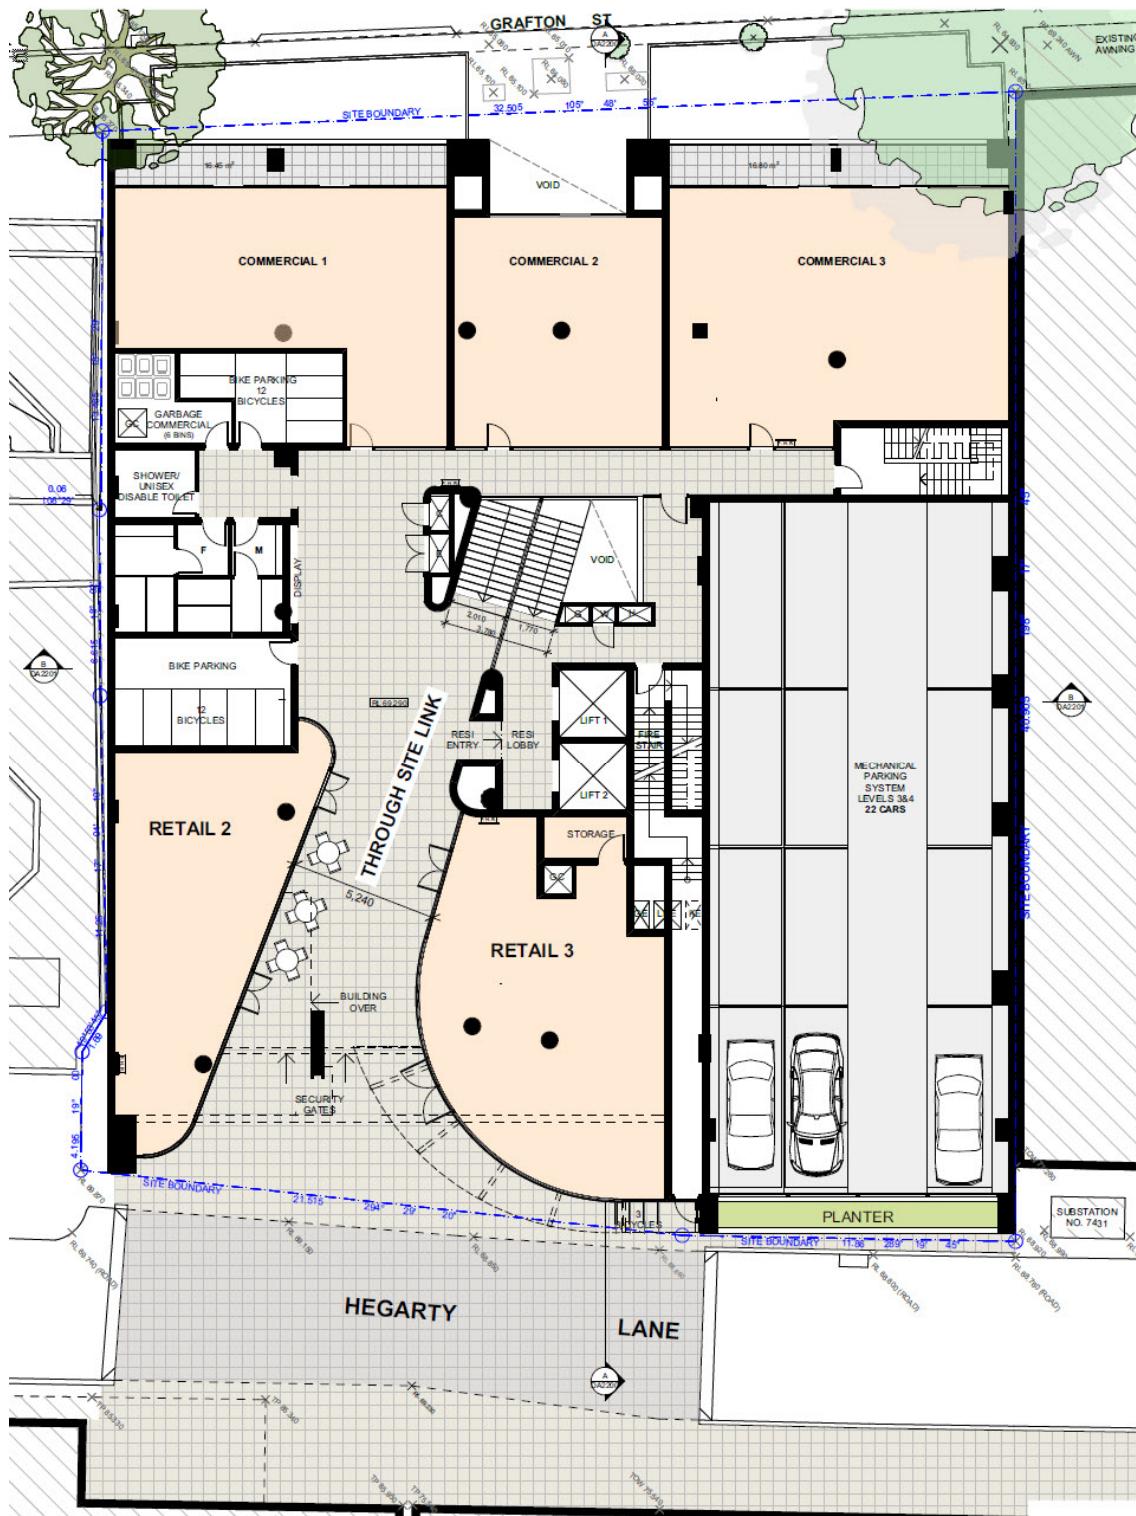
Original Upper Ground Floor Plan (Source: Cottee Parker JPPA, DA 2101_A)
